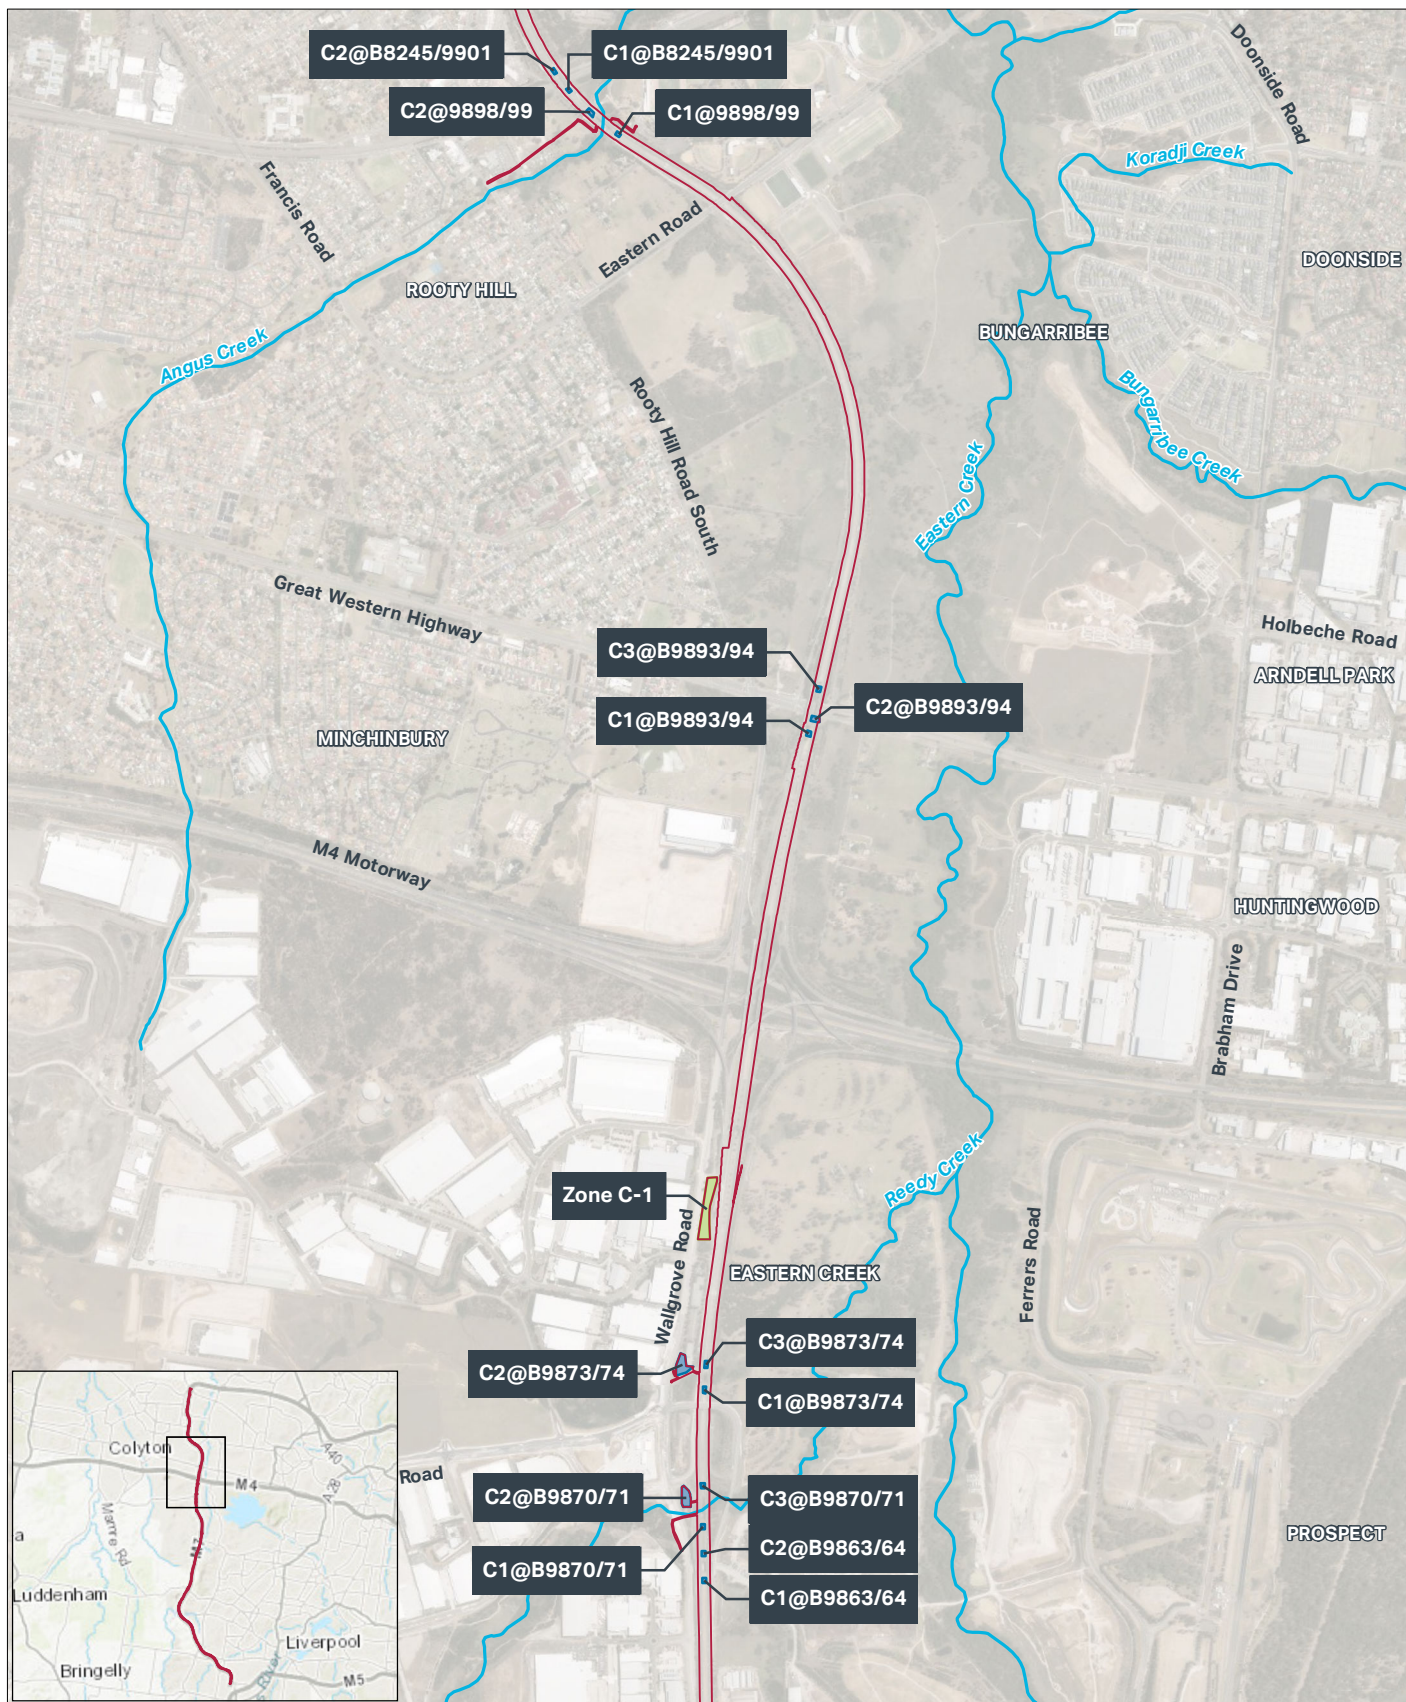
CONSTRUCTION FOOTPRINT FOR THE PROPOSED MODIFICATION
